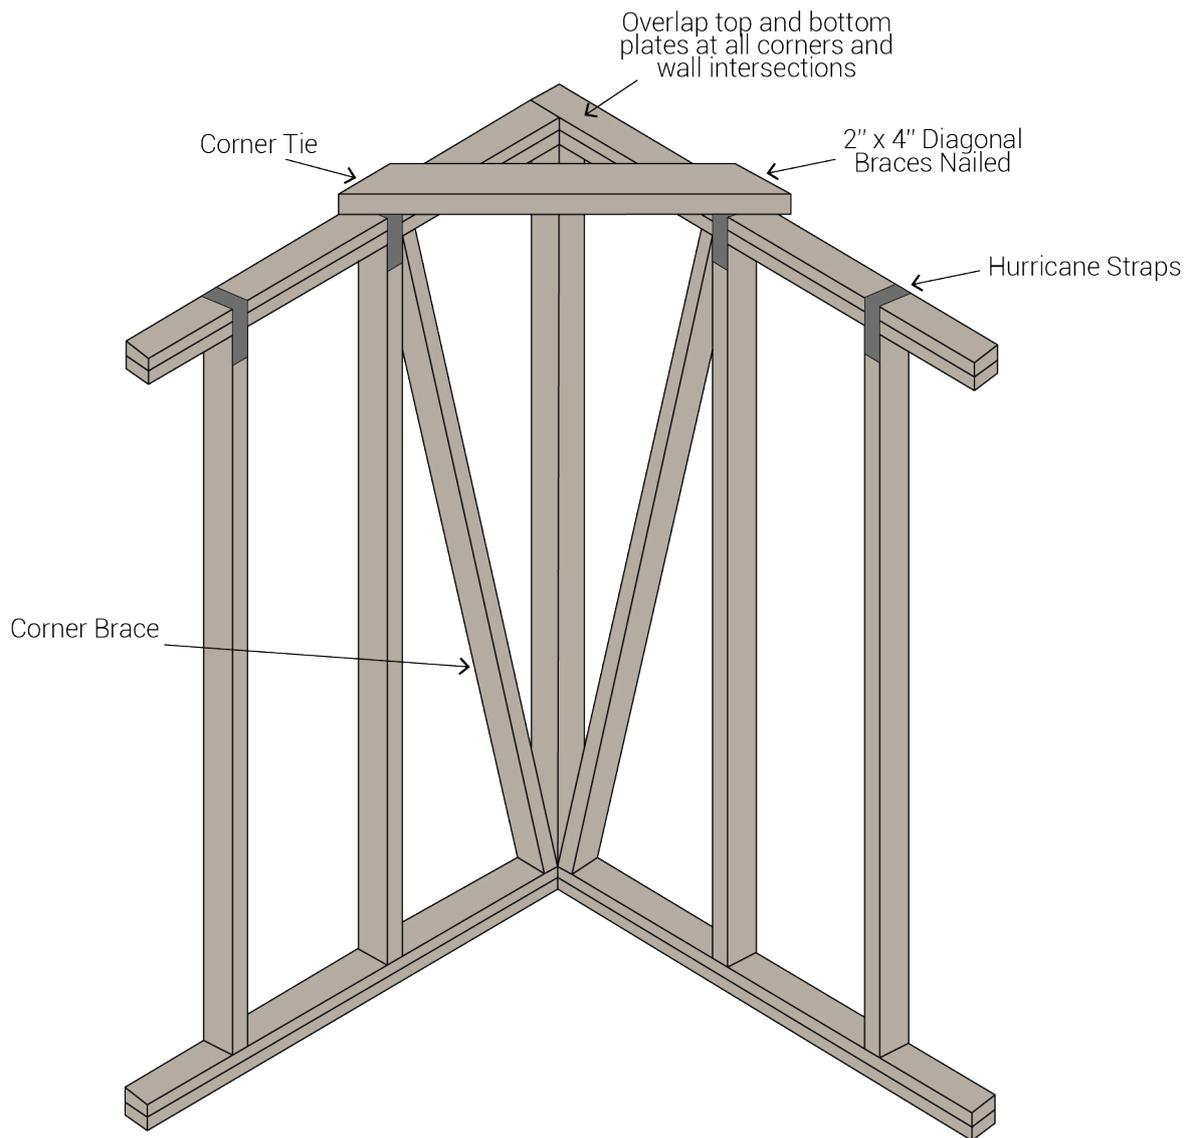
Timber wall intersections. Own elaboration based on: UNDP; Engineers Without Borders, (2018).
